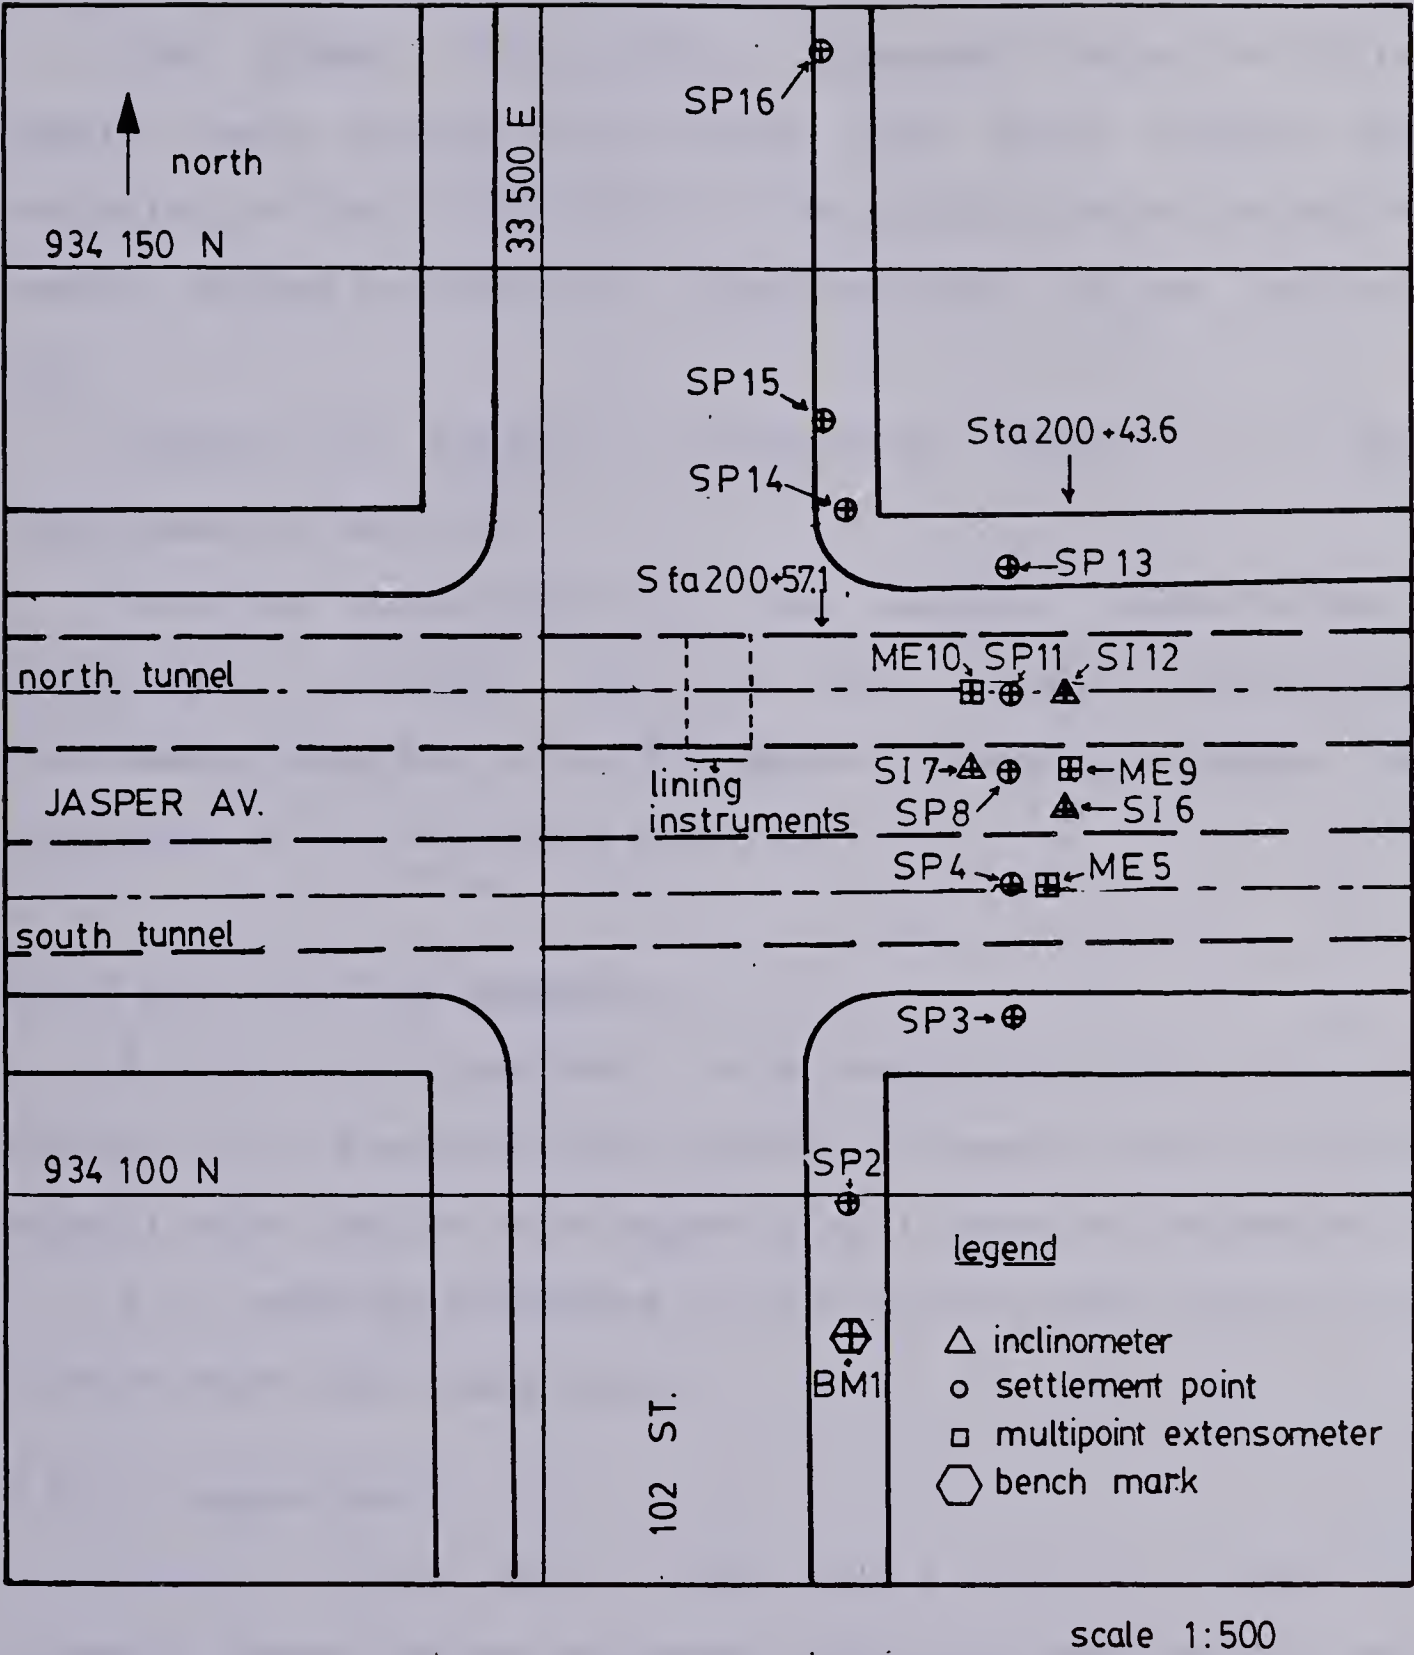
INSTRUMENTS LOCATION - PLAN VIEW
